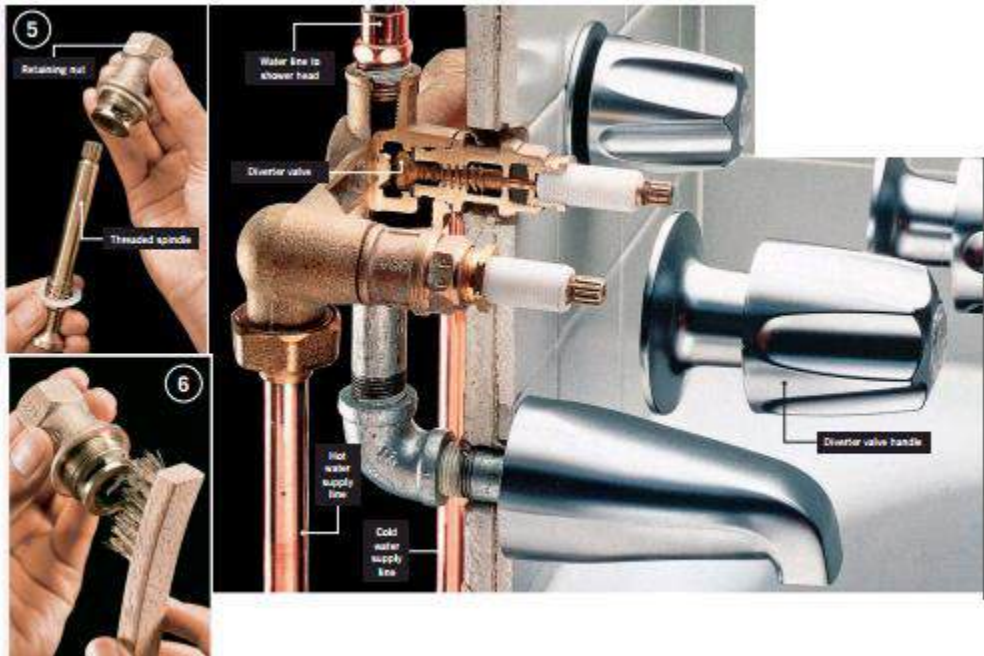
Fixing Three-Handle Tub and Shower Faucets
